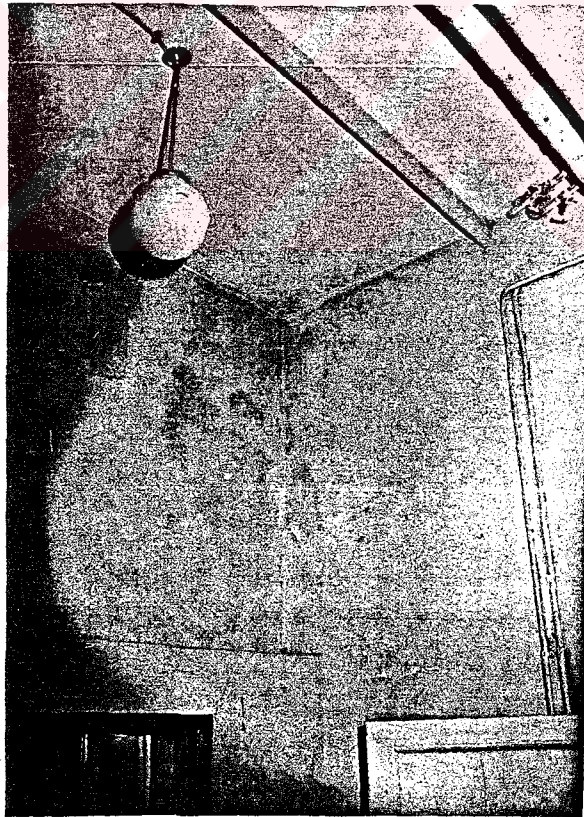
The Inspection Committee building - basement floor - the third room on the SE of the hall (1987)
